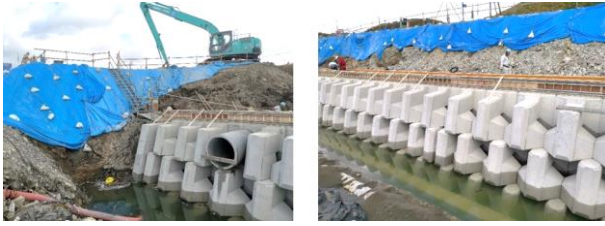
Scene of the construction site of wave-dissipating block installations at Toyoura coast
